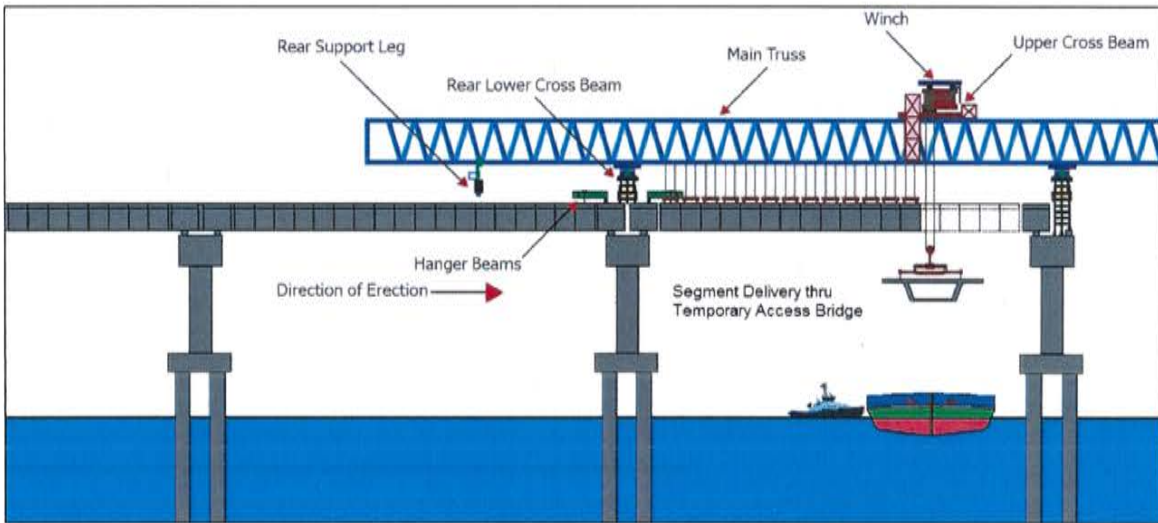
Installation of PC Girder by Launching Girder at Sea water Offshore
